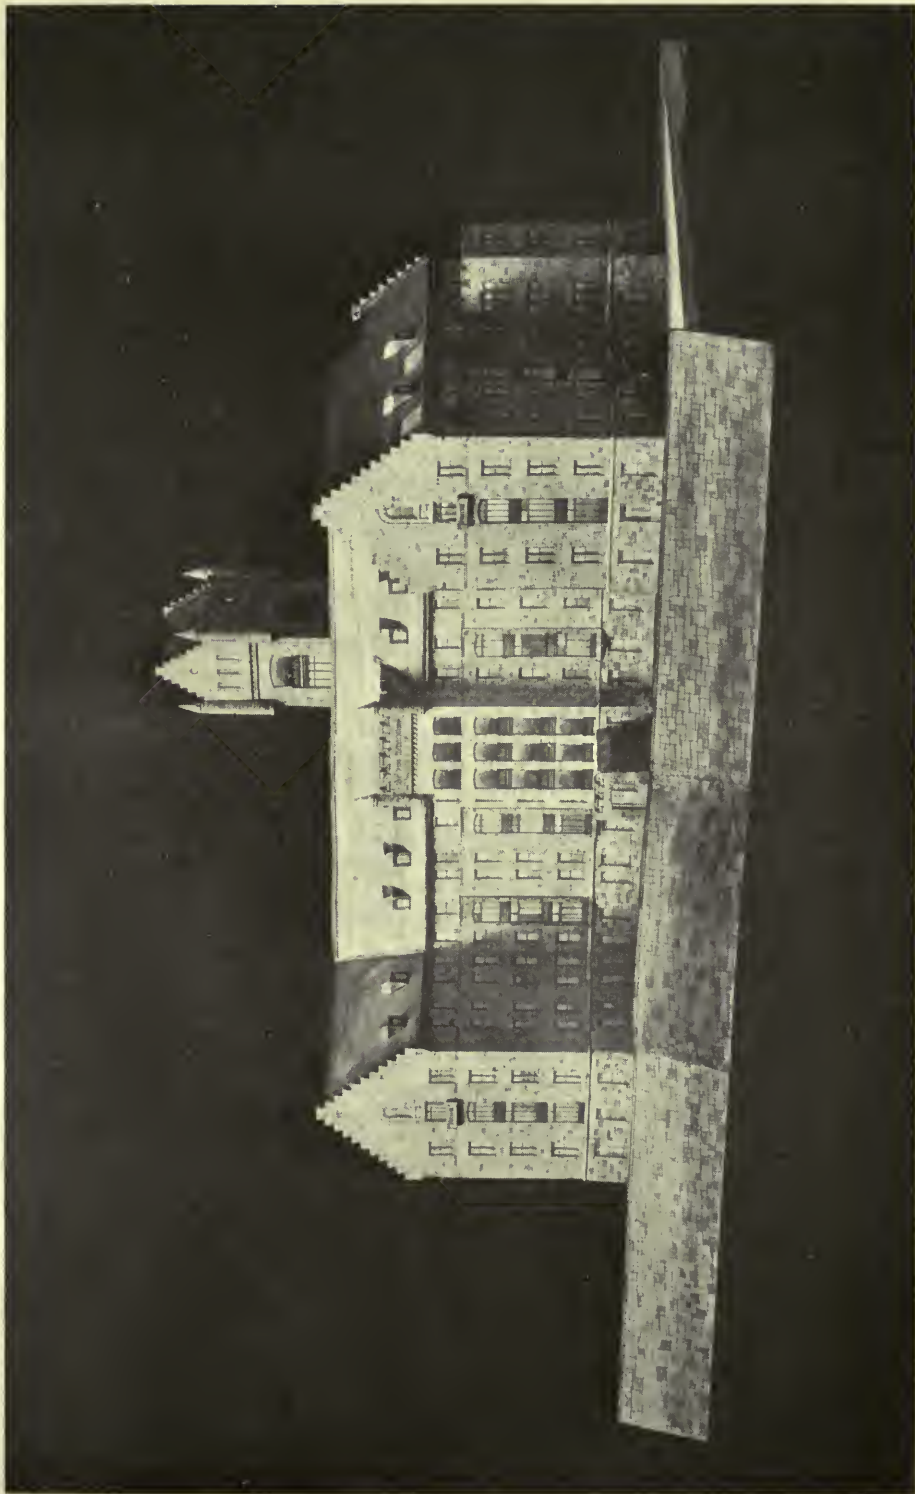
SKETCH OF EXTERIOR—ROSS PAVIL-
